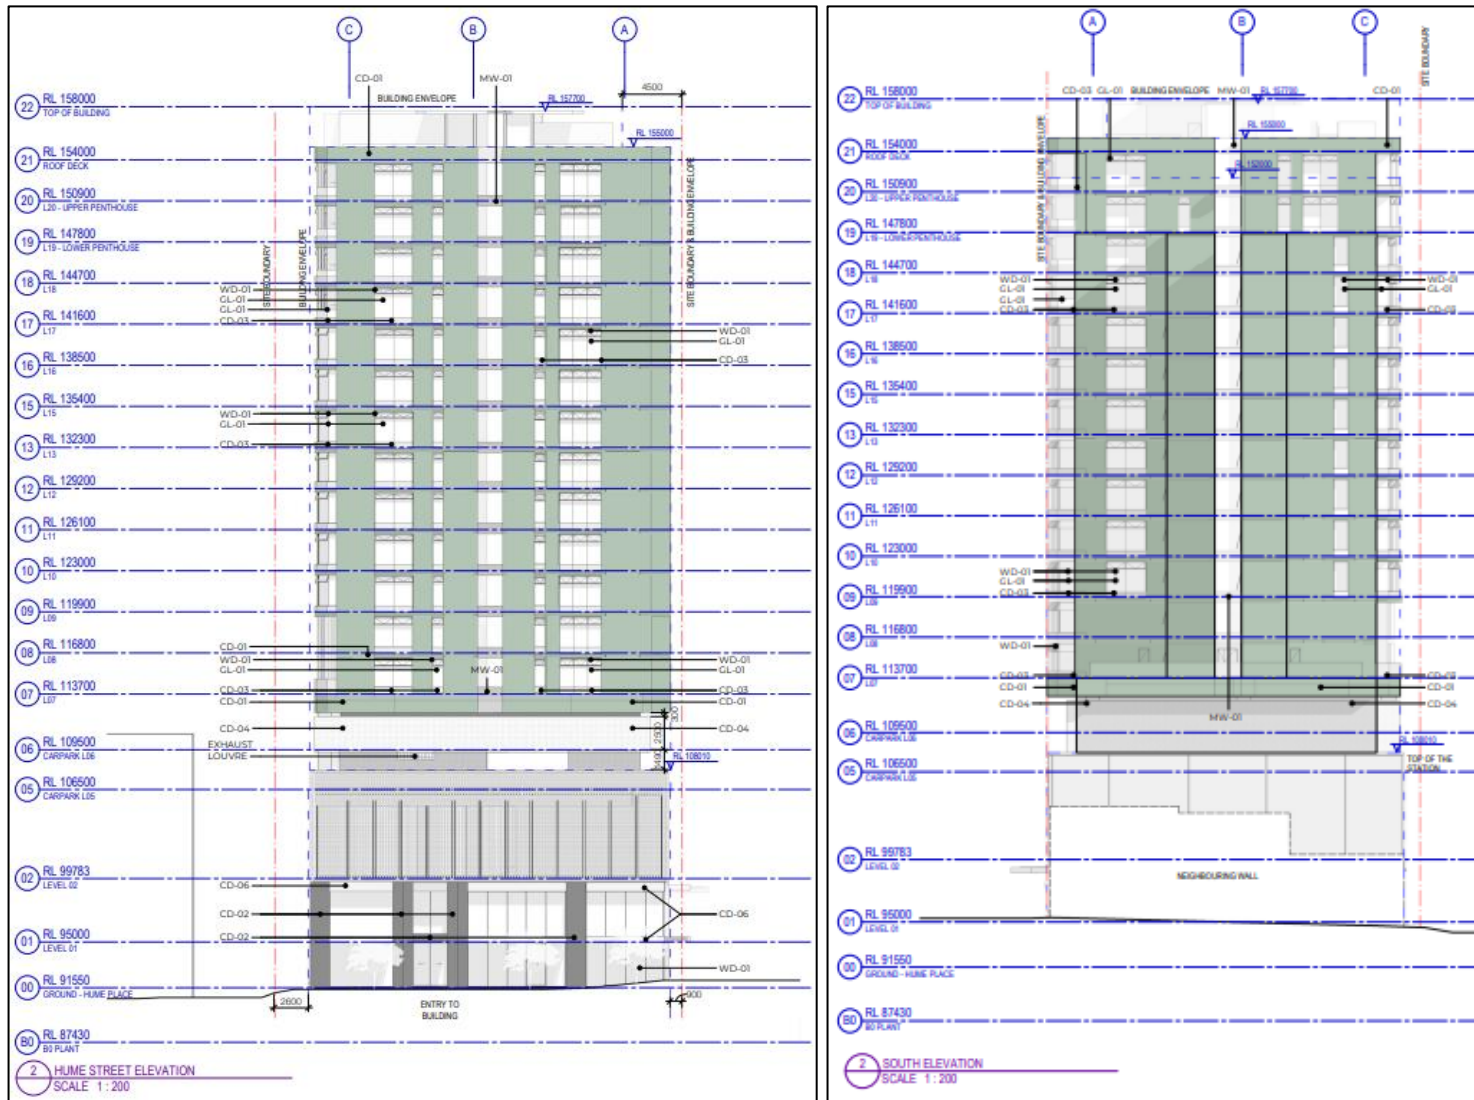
Hume Street and South Elevation (Source: Woods Bagot, 2024)
